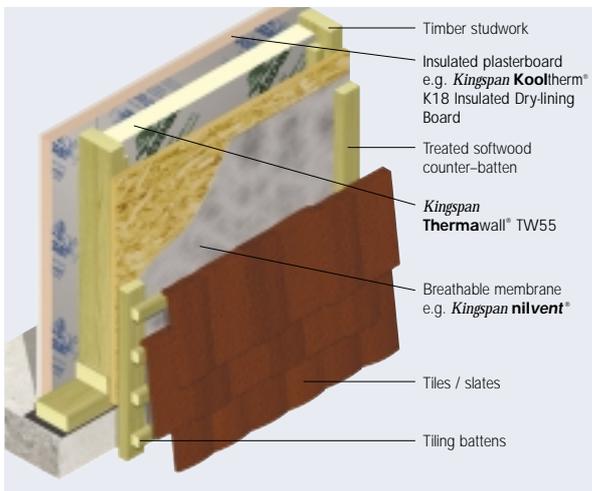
Timber Clad / Tile Hung Timber Frame Wall – Insulation Between Studs and Insulated Dry-lining
